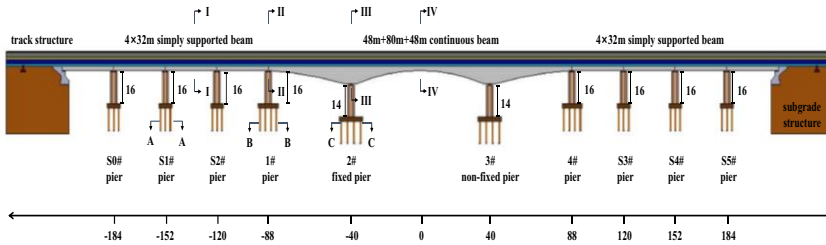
High-Speed Railway Continuous Beam Bridge Model
